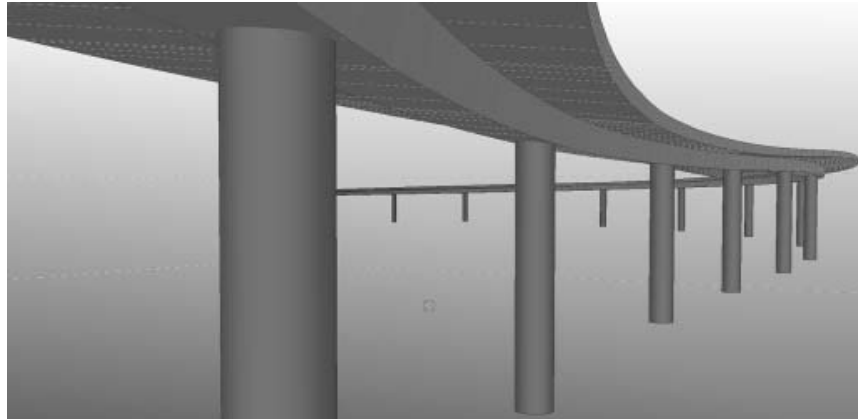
An arched concrete slab modeled in a Finnish test (Tekla Structures)
